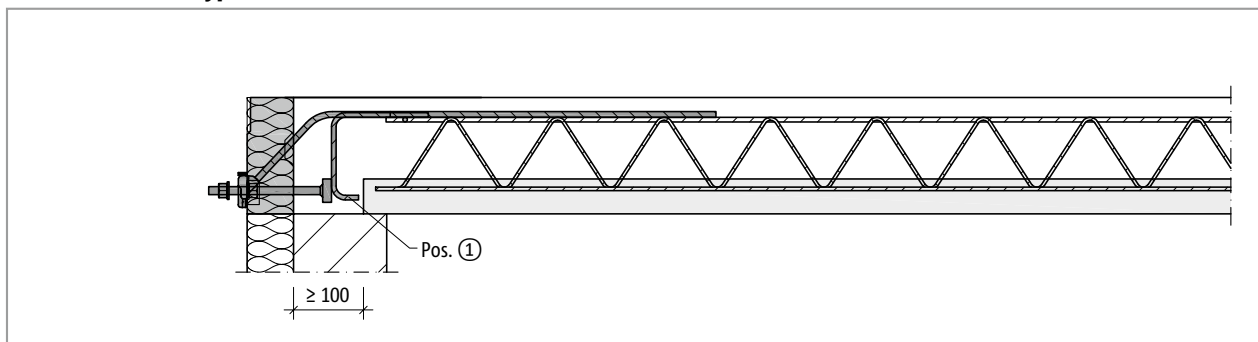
Schöck Isokorb® T type SQ: On-site reinforcement for semi-precast construction: Cross section
